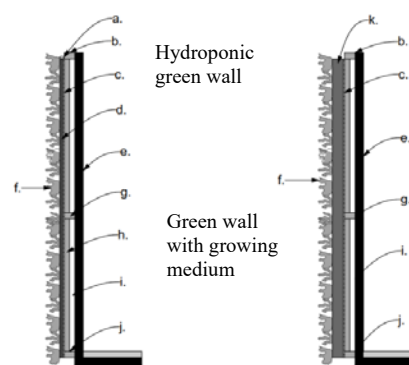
The differences and similarities between hydroponic and growing medium based green wall. a. water sprinkler; b. upper structural console; c. PVC water insulation layer; d. root bearer layer; e. building wall; f. plants; g. middle structural console; h. auxiliary load bearing structure; i. air gap; j. bottom structural console; k. growing medium in panels
